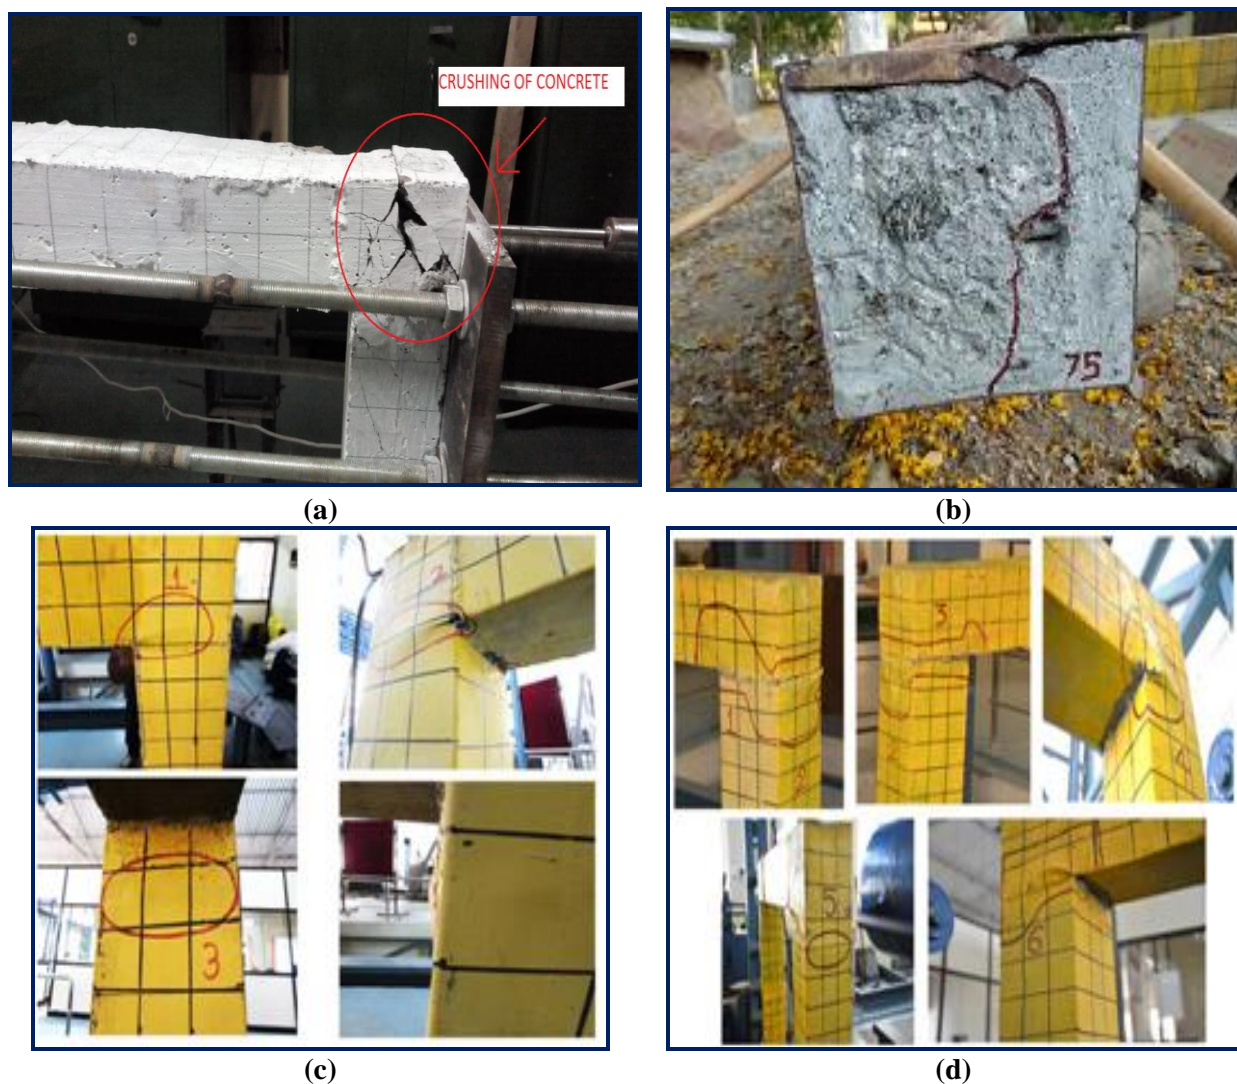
Specimen failures: (a) Bare Frame (b) SP-75; (c) SP-100; (d) SP-125
